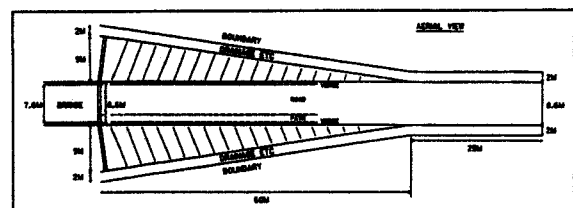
Sketch showing the length of proposed land take from abutment to a tie-in point on the existing road (CAD sketch: Chris Dawson)
